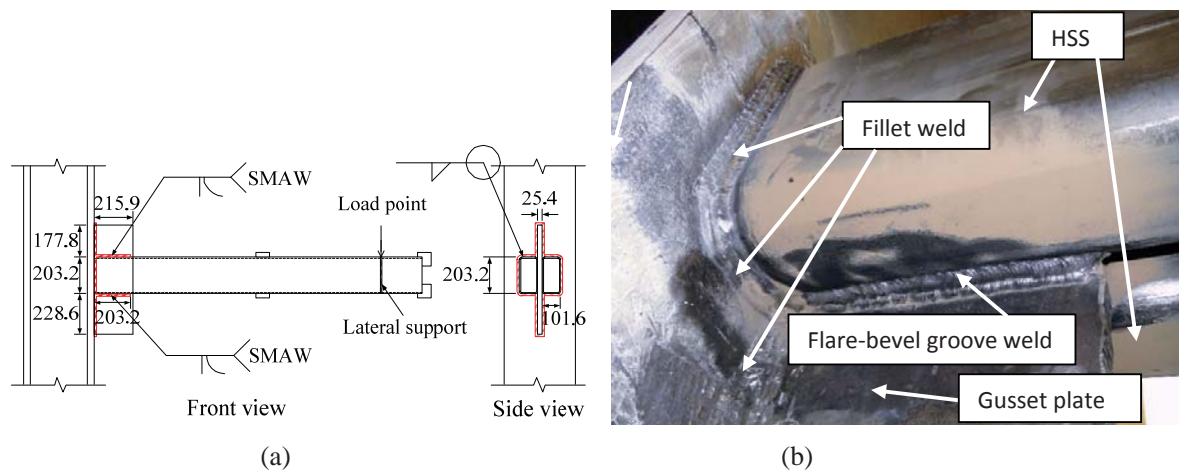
Proposed double-HSS connection for special moment frames: (a) cross-section and elevation views and (b) weld details at the end of the connection
